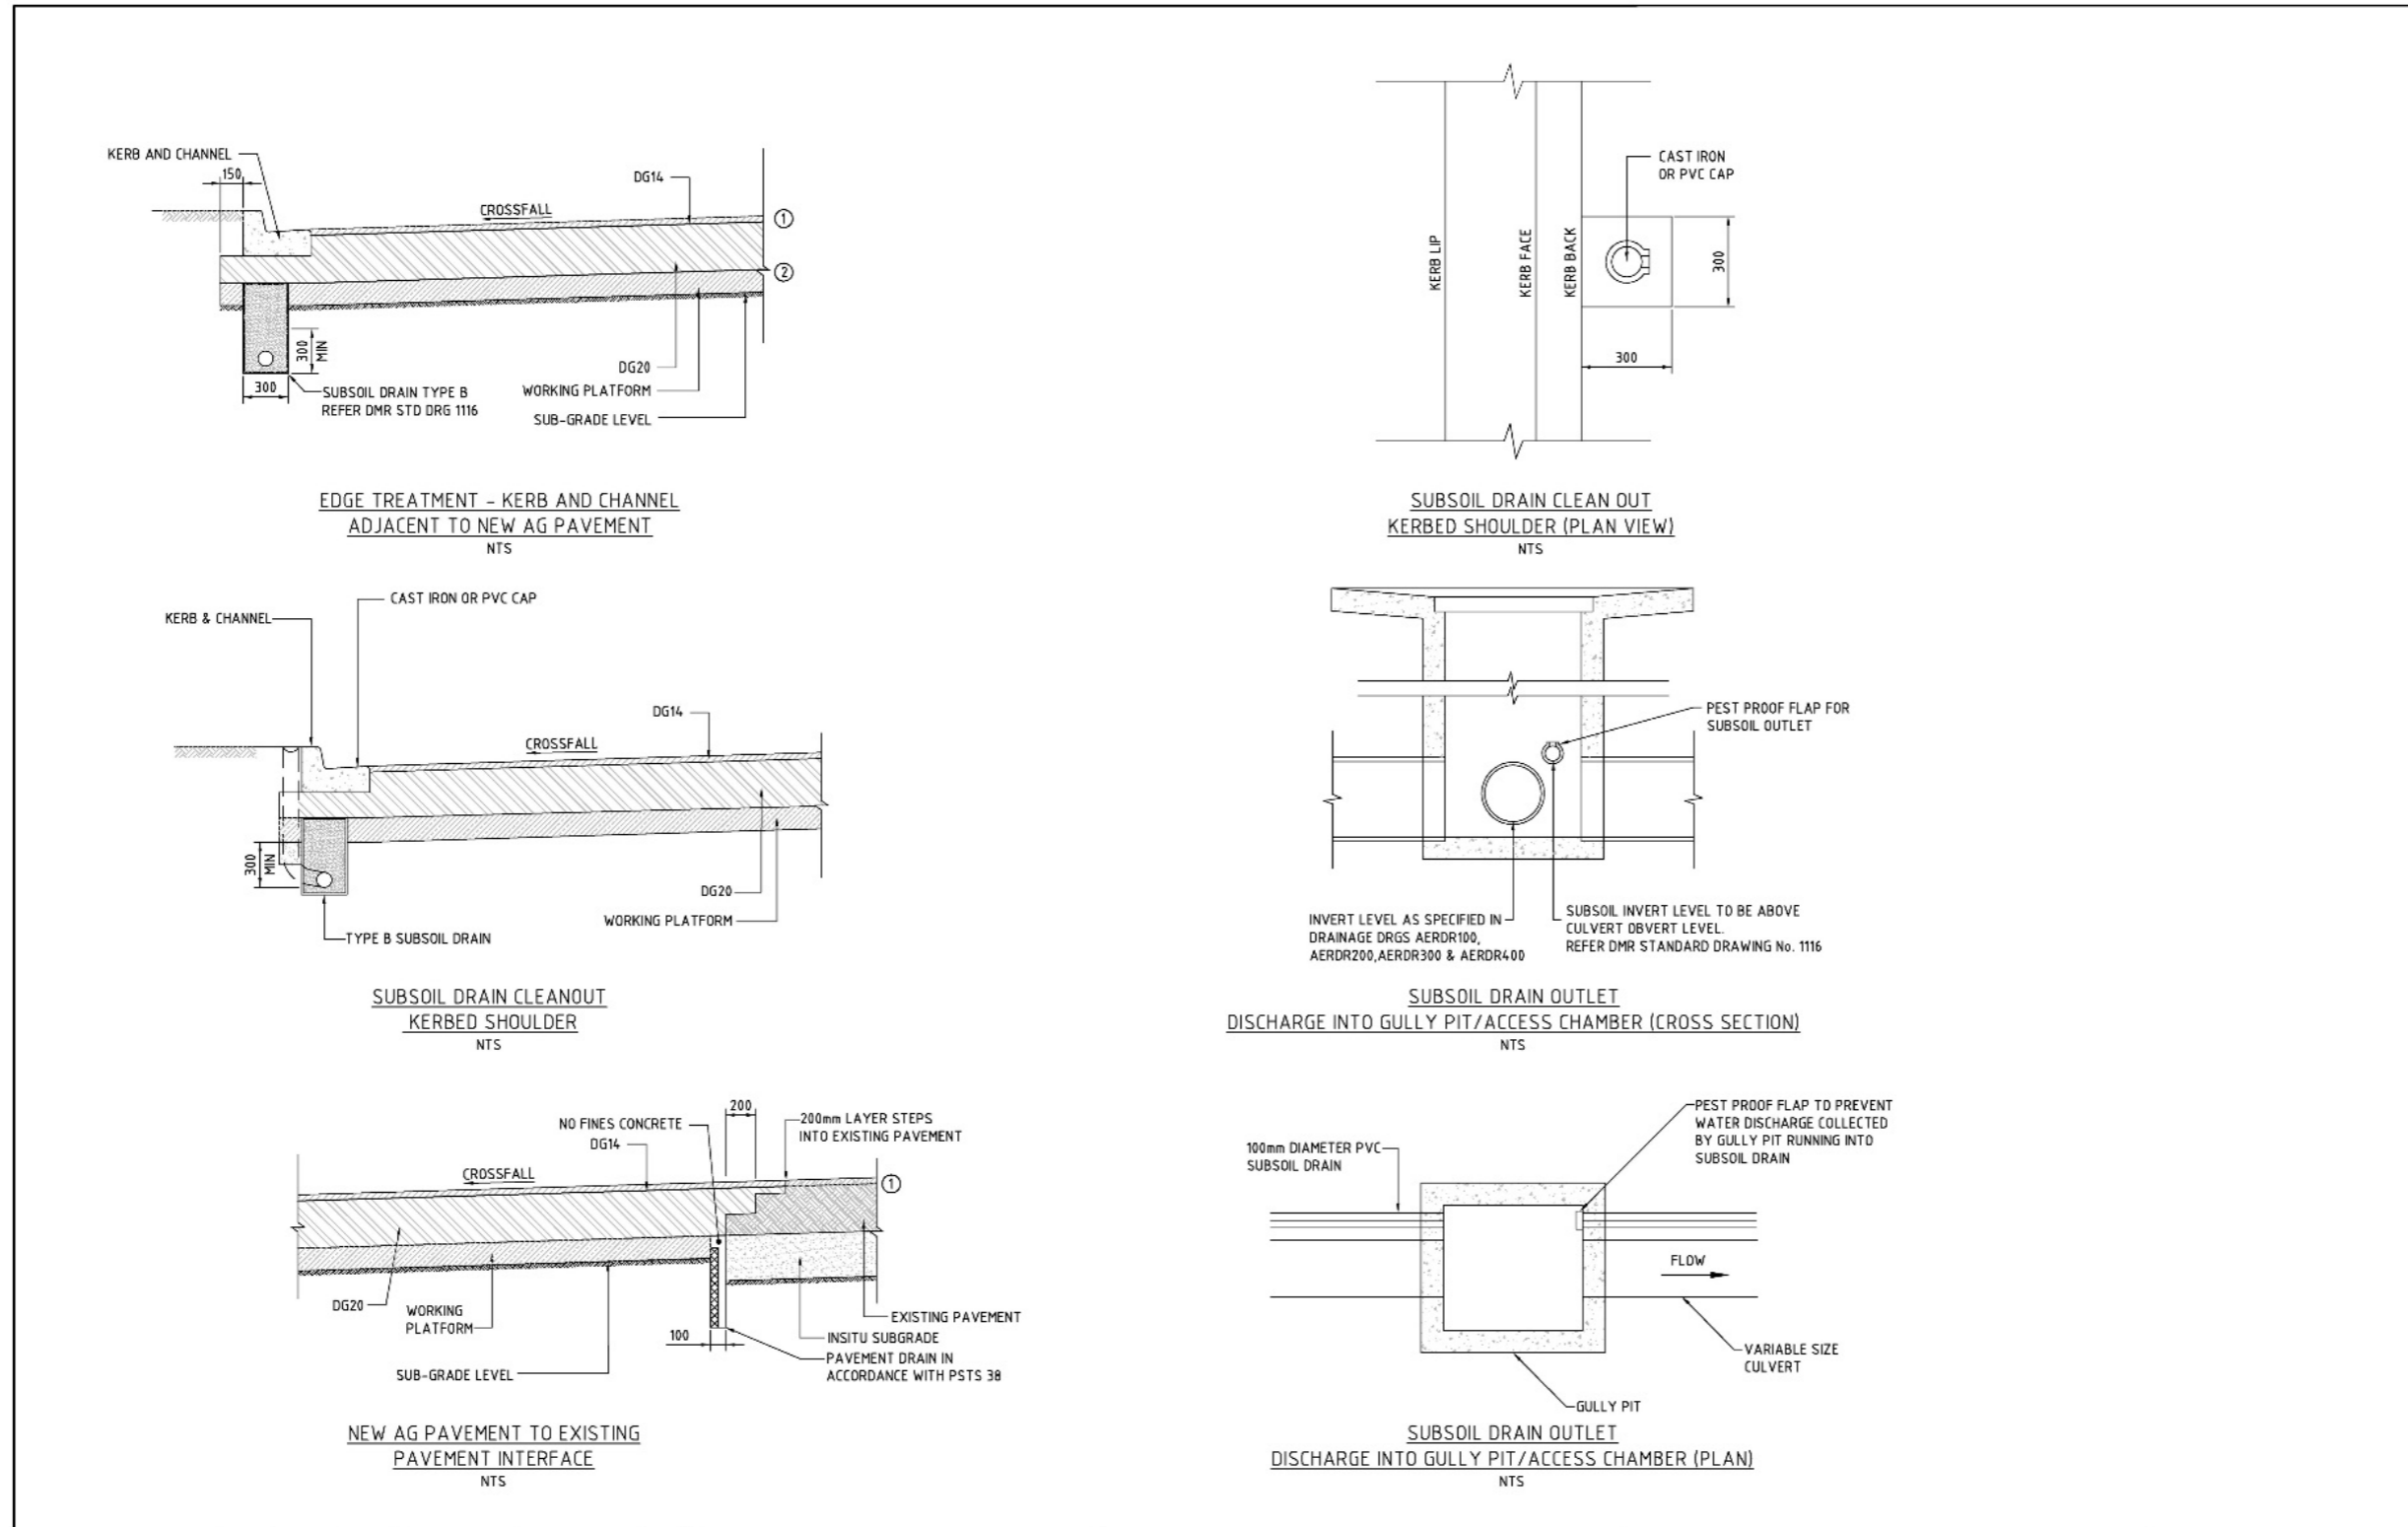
(g) – Pavement Subsoil Drains Details – generic example
